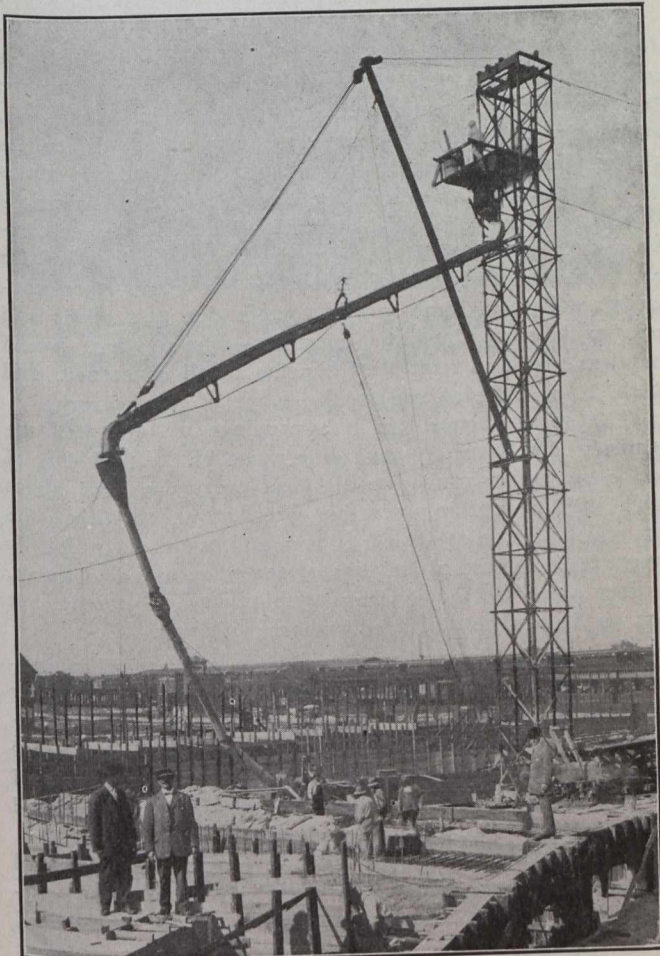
View of Steel Tower, Showing Concrete Chute in Position.
